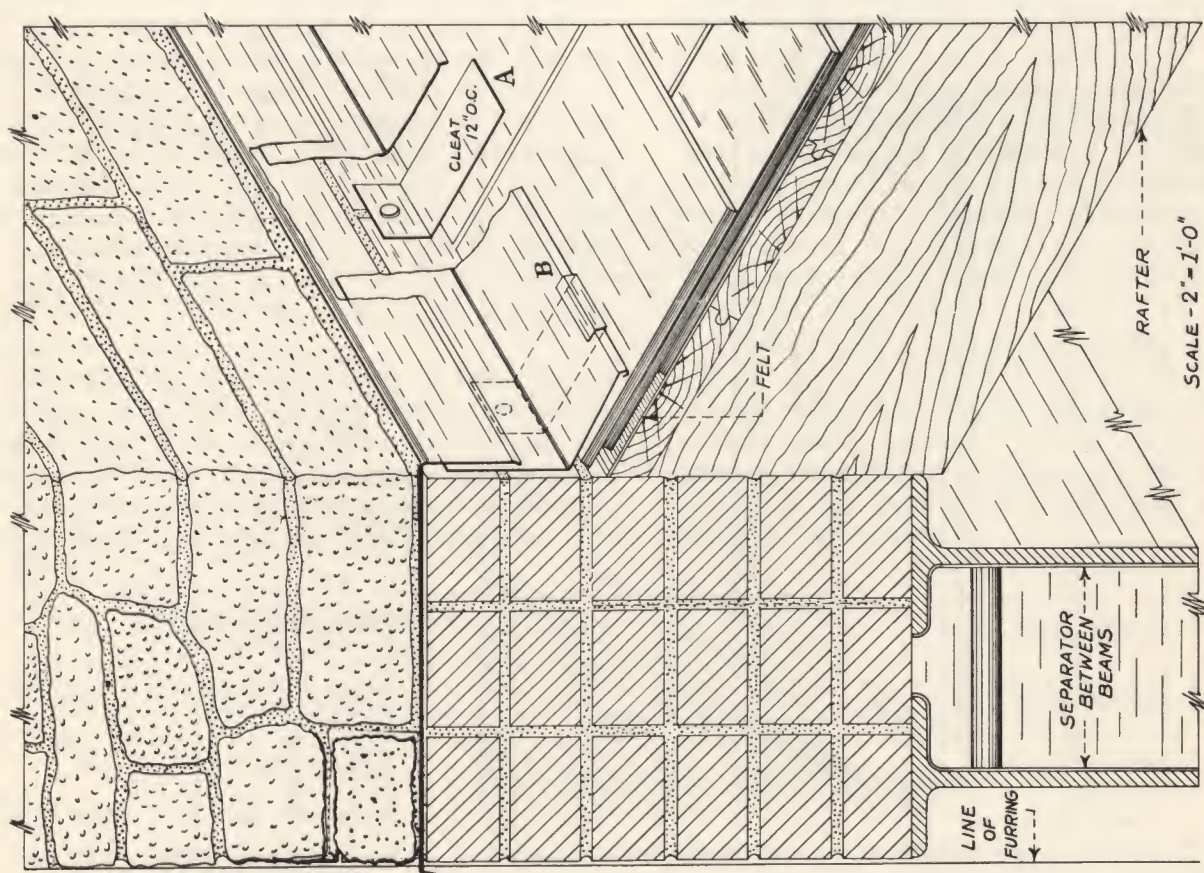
METHOD OF APPLYING CAP AND BASE FLASHINGS AT WALL ABUTMENT
